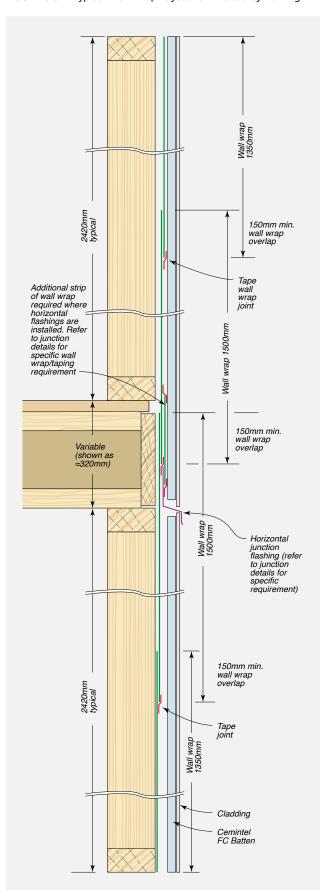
Typical Wall Wrap Layout for Two-storey framing
